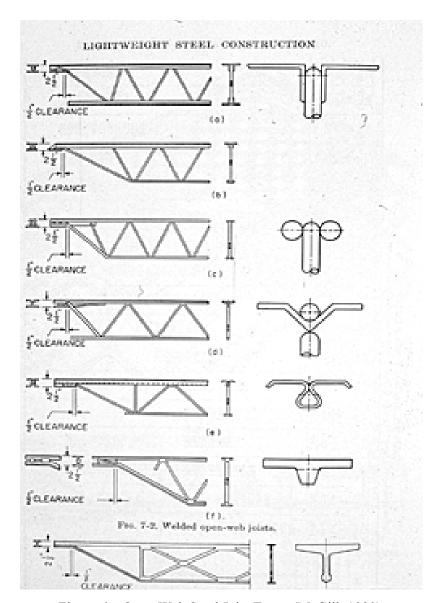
Open Web Steel Joist Types (McGill, 1980)
